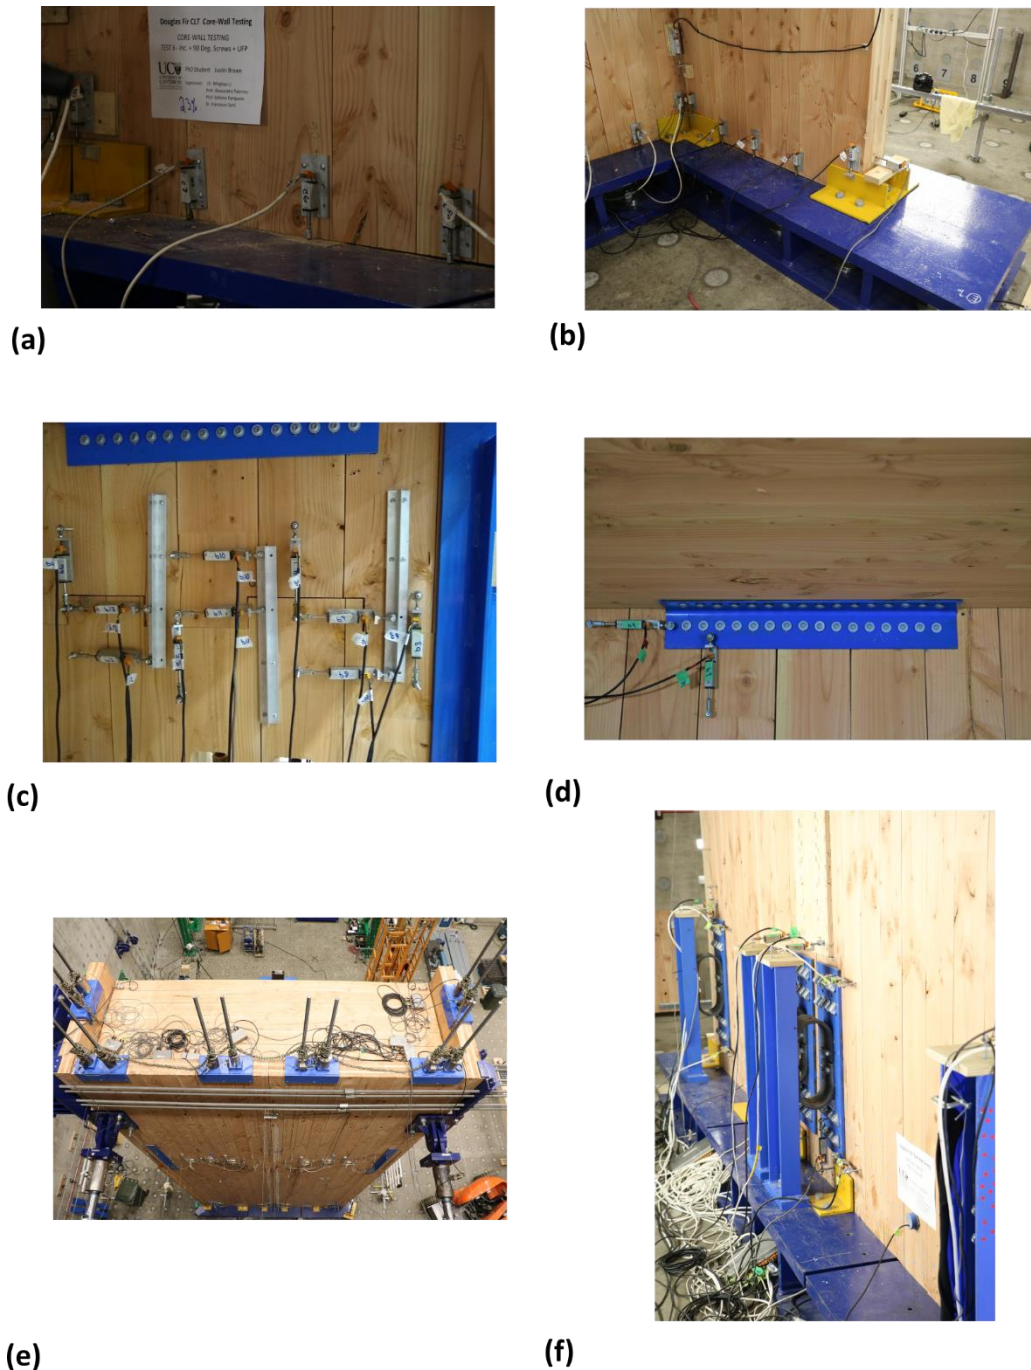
Key test instrumentation: (a) and (b) wall base neutral axis tracking, (c) castellations tracking, (d) diaphragm connection tracking, (e) post-tensioning bar load cells and out-of-plane movement tracking, and (f) UFP connection tracking
